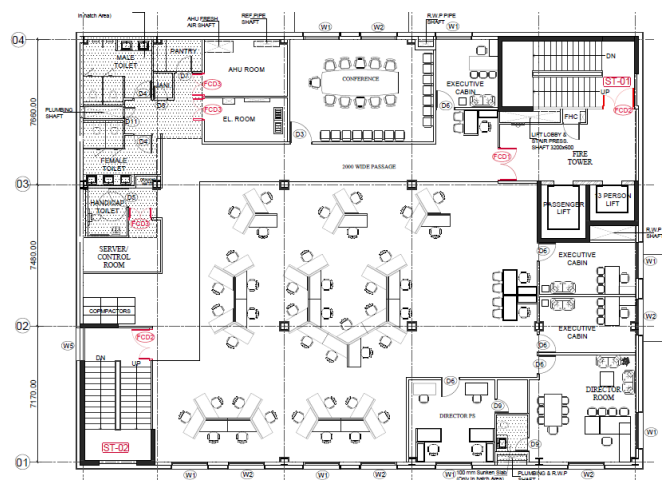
Typical Architectural Plan of the Building Showing various rooms, staircases and lifts
